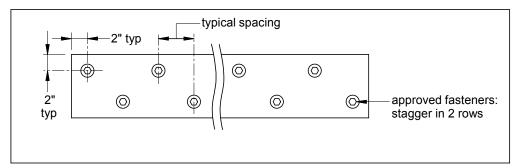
LEDGER BOARD FASTENER SPACING AND CLEARANCES
